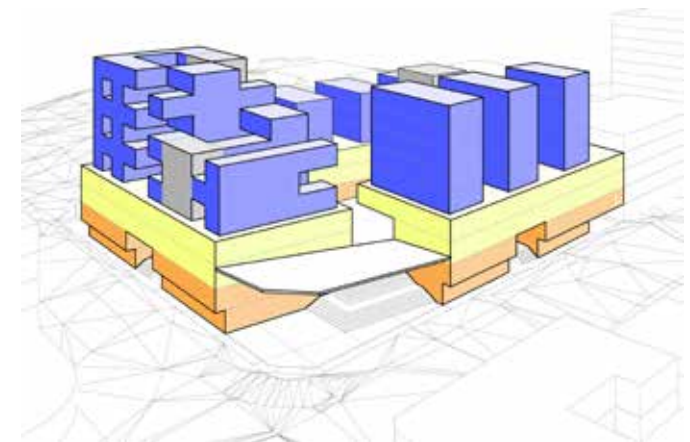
Units arrange around edge cores on opposite sides building layout
